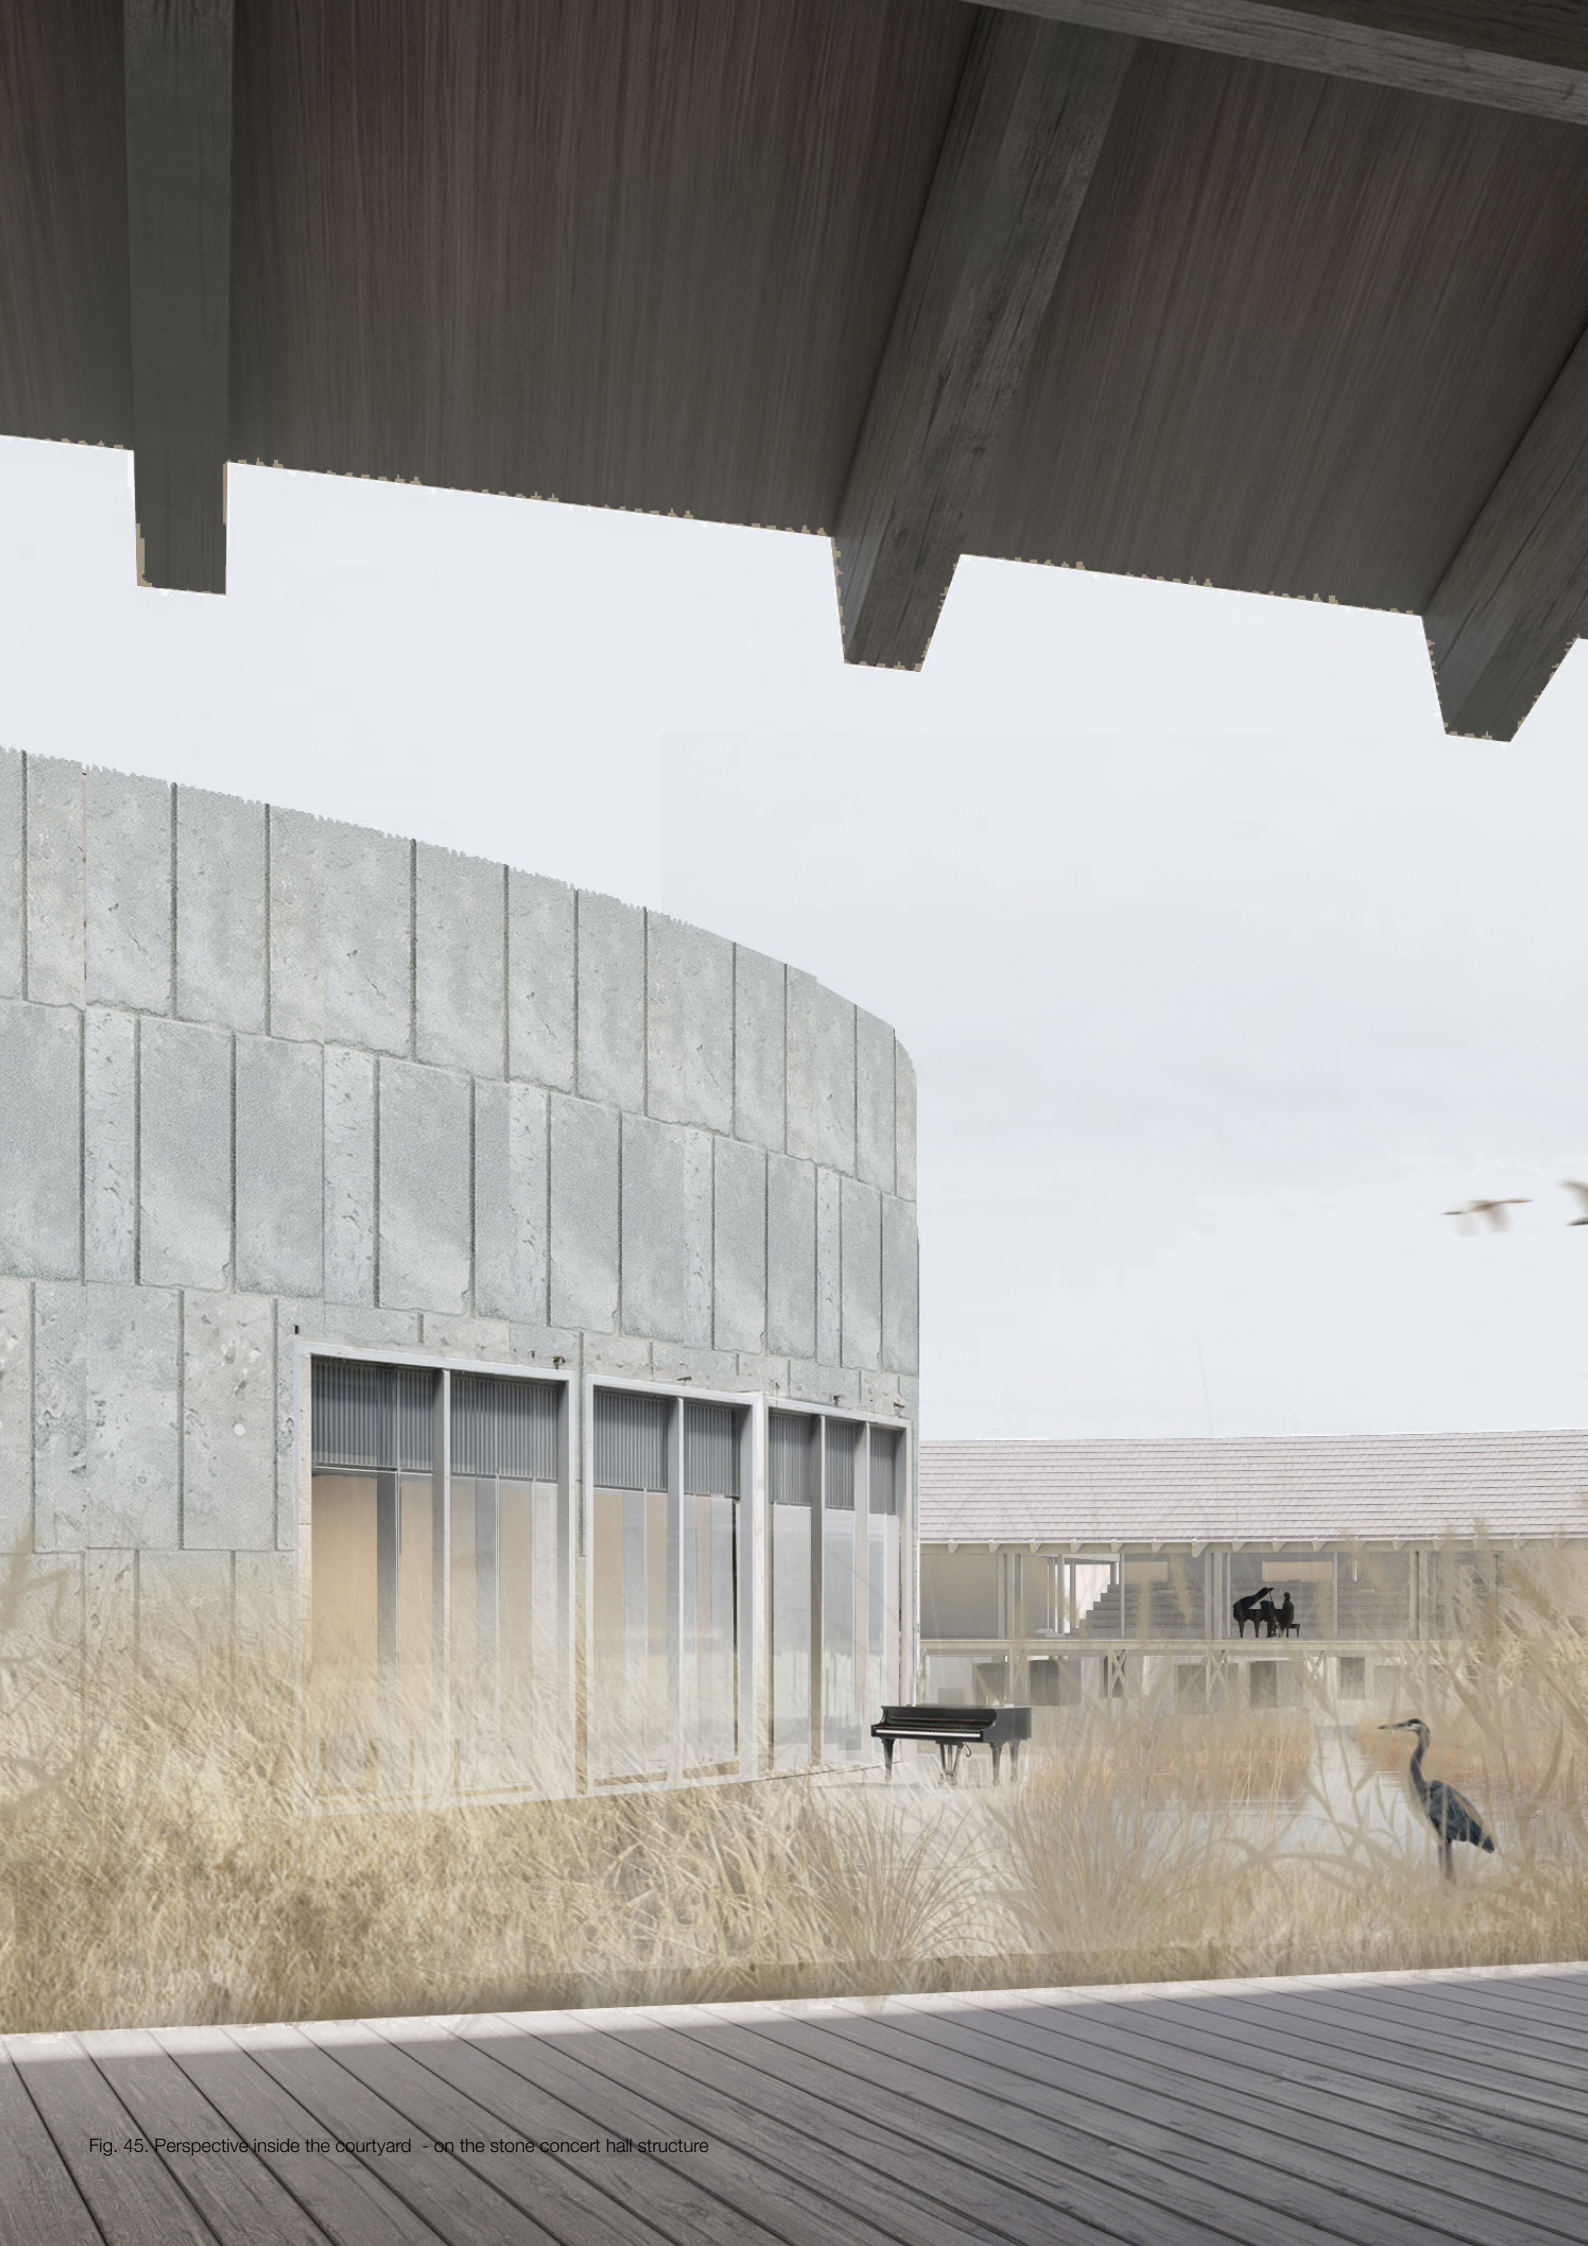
Perspective inside the courtyard - on the stone concert hall structure
